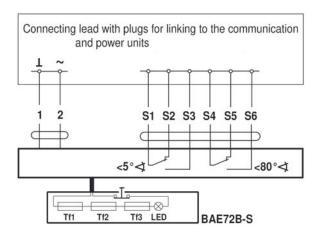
Wiring scheme of actuator BELIMO BLF24-T-ST
